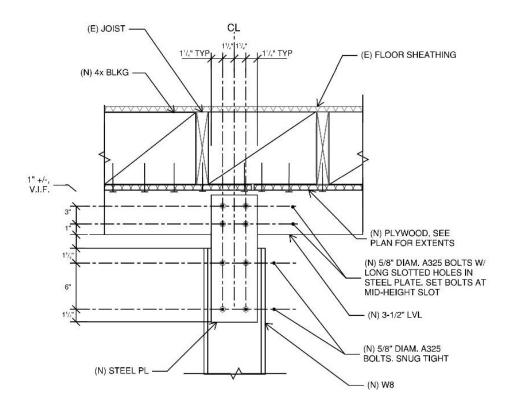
Load path connection from top of steel cantilever column to LVL collector.
